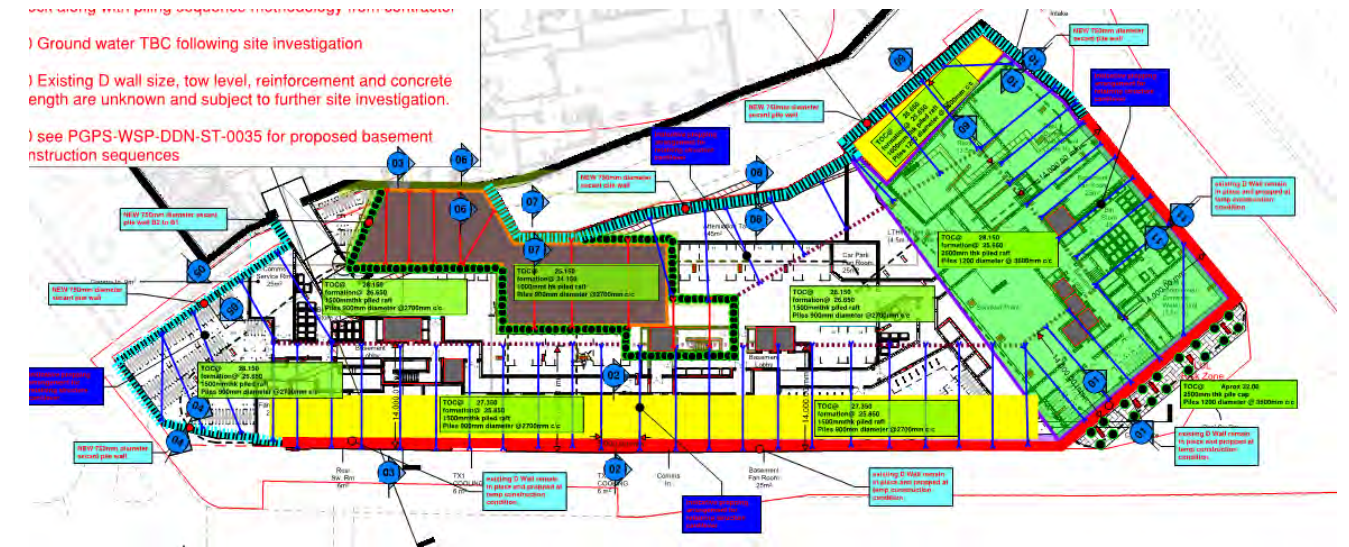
Proposed Design Development Basement Layout and Foundation levels
